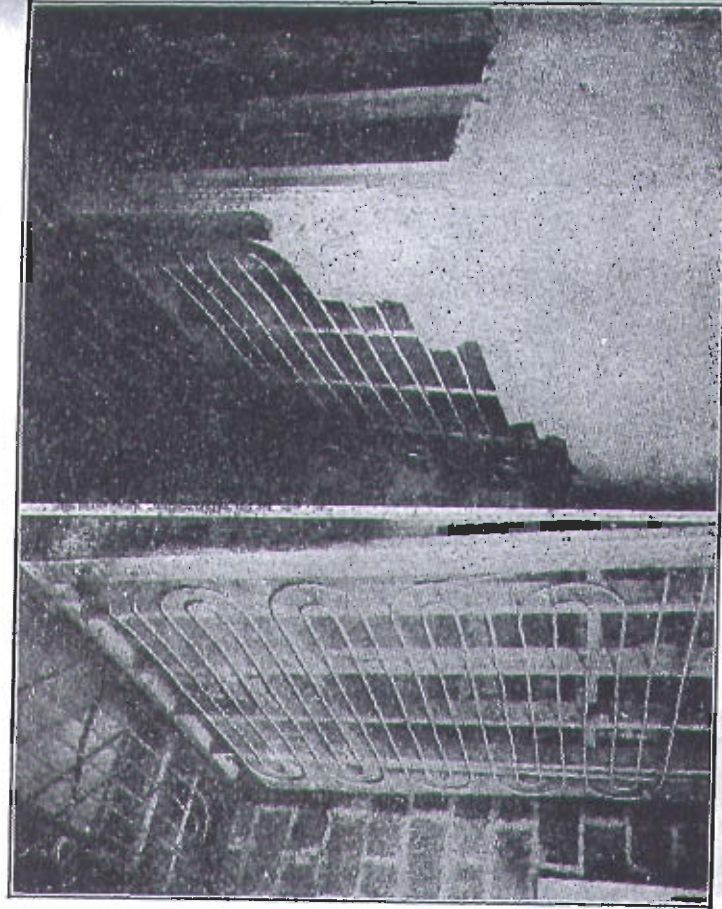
Showing typical installation of wall panel in radiant heating system. Although wall panels are usually confined to the upper parts of the walls, bathroom and certain kitchen installations can be run to the floor for concentrated heating. Courtesy Chase Brass & Copper Co.
